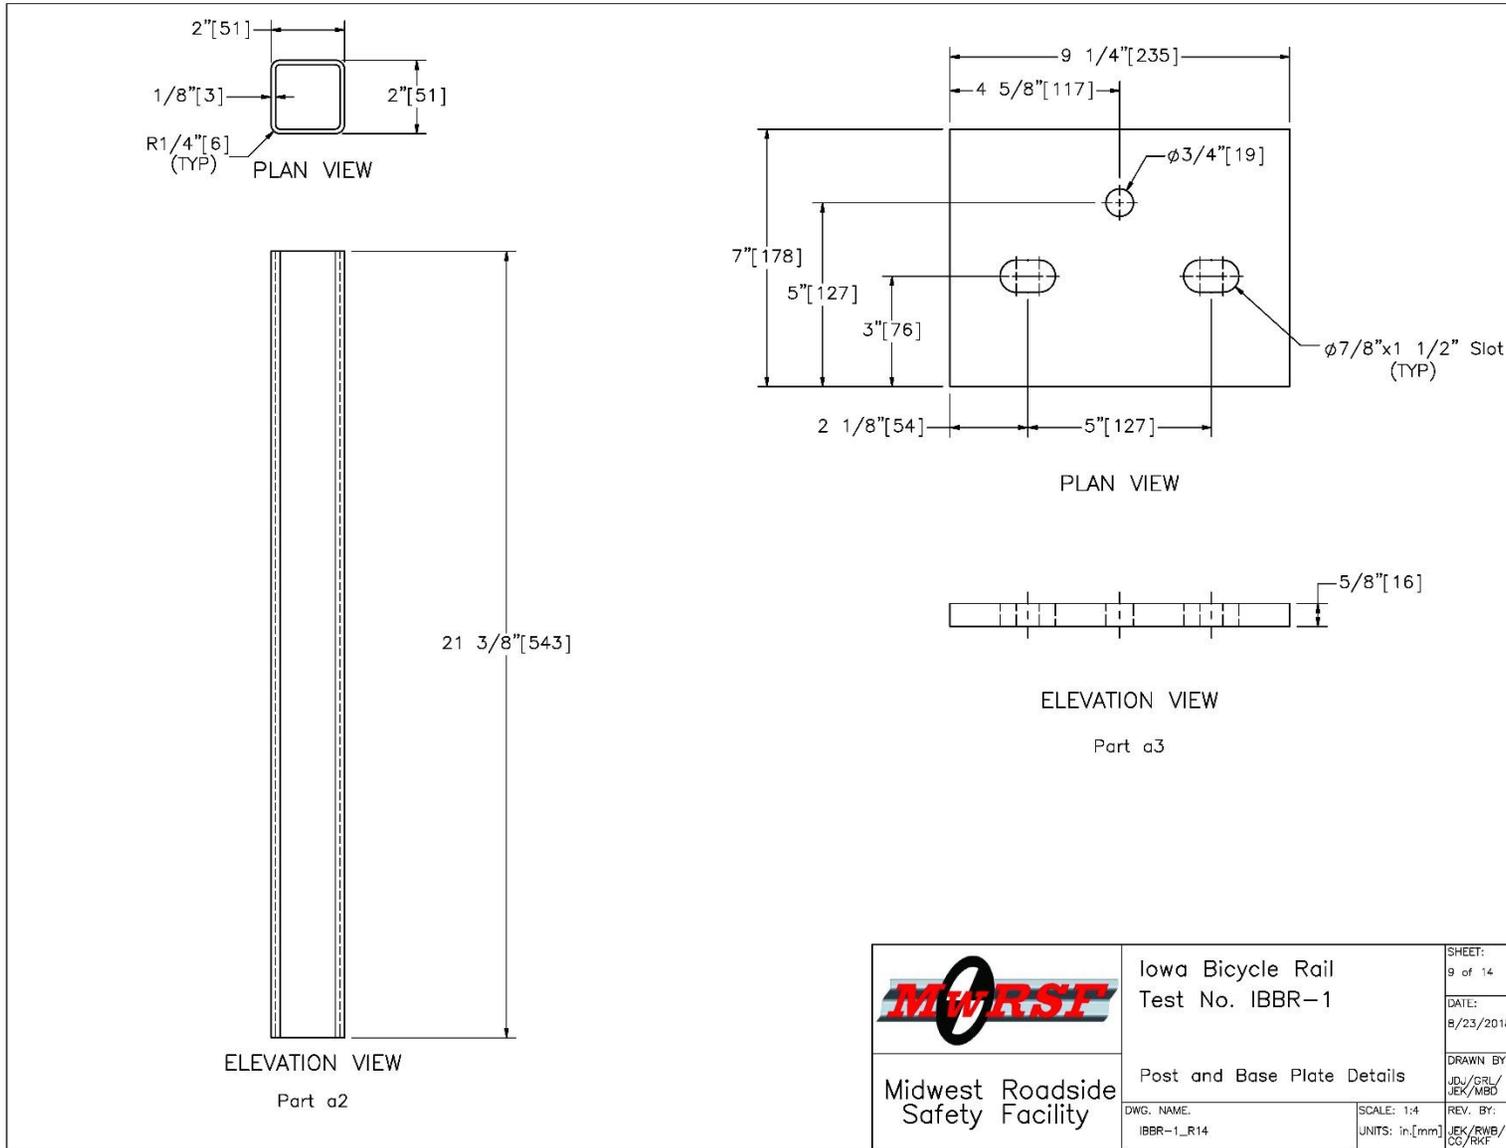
Post and Base Plate Details, Test No. IBBR-1
